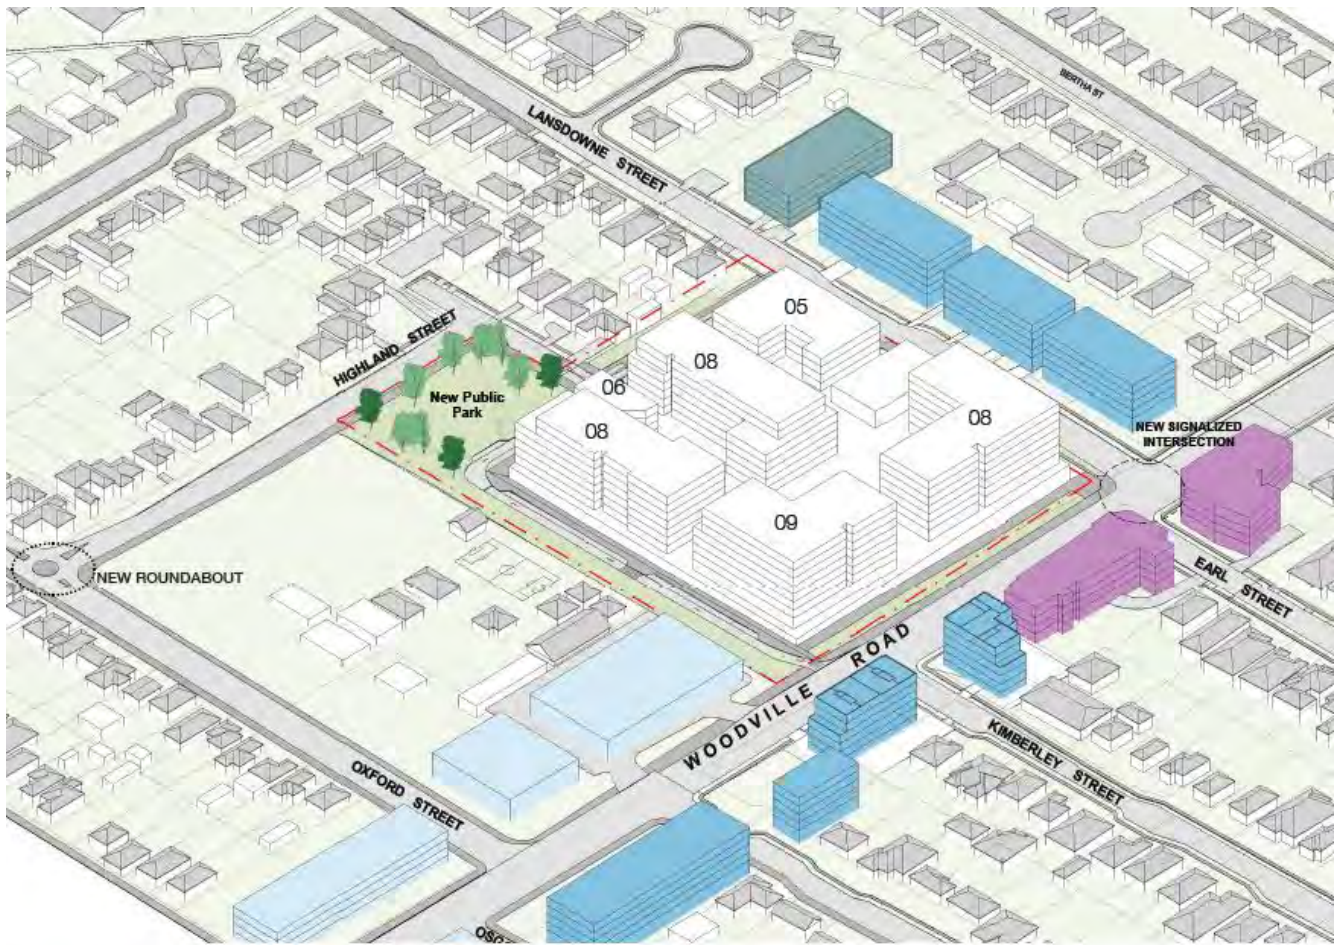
Site plan of approved mixed use development on the subject land in DA No.2020/0493
